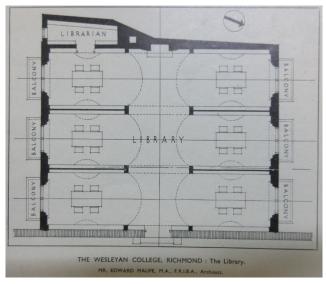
Ground floor plan of Maufe's library extension (The Builder, 15th Jan 1937).
